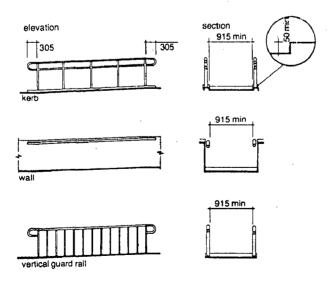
Examples of ramp edge protection and handrail extensions [17]
